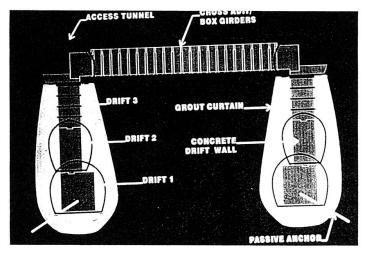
Cross-Section of Underpinning Systems with Drift Walls, Grout Curtain and Post-tension Box Girder Roof.
